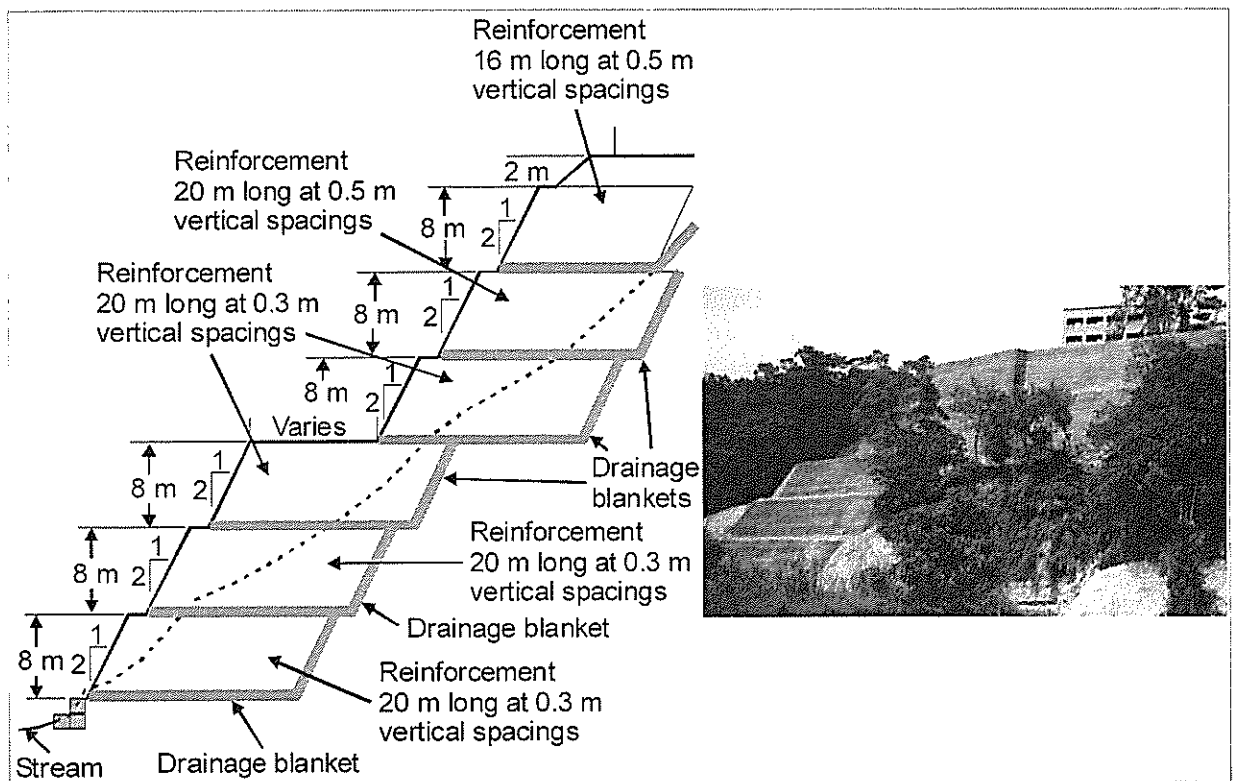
Steep Reinforced Fill Slope, Nan-Hua, Taiwan.
